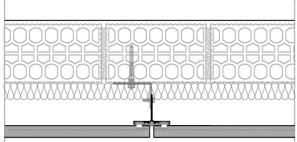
Horizontal section. Faveton® SAH Ceram 28.
